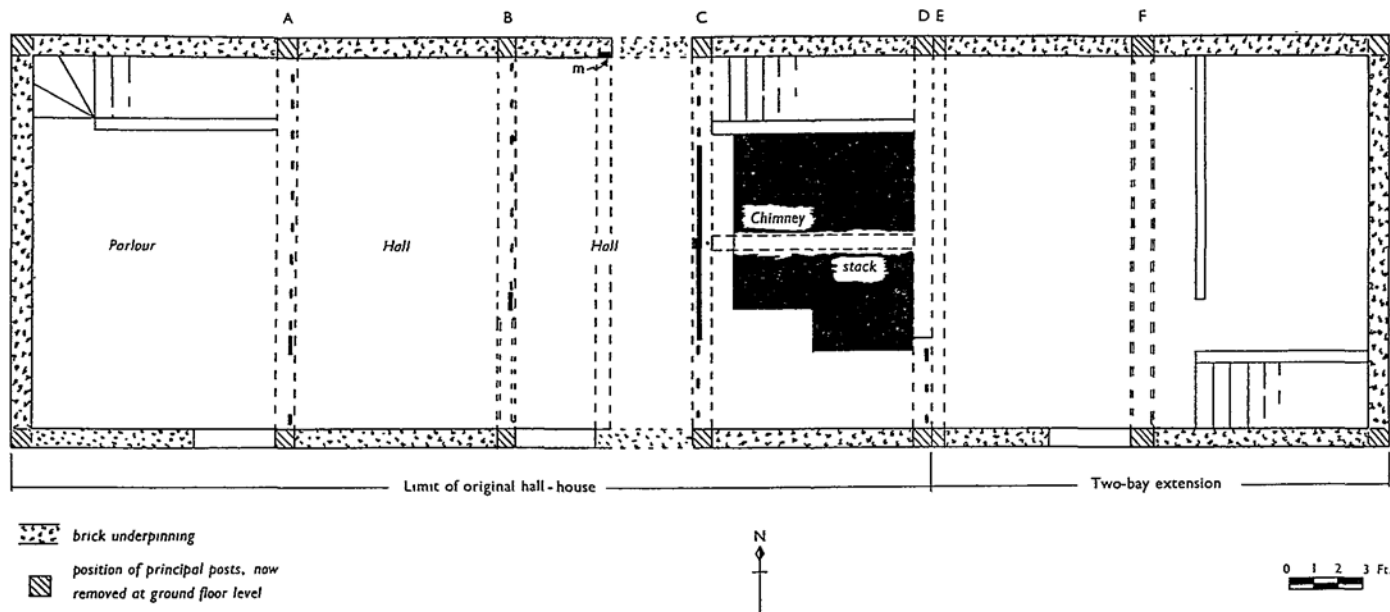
Ground Floor Plan. The suggested position of a screens passage, with a door at each end, is immediately west of truss C. A modern chimney stack abuts on to the west end of the building, and rises above the apex of the gable.
